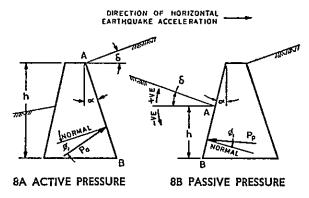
Earth Pressure Due to Earthquake on Retaining Walls
